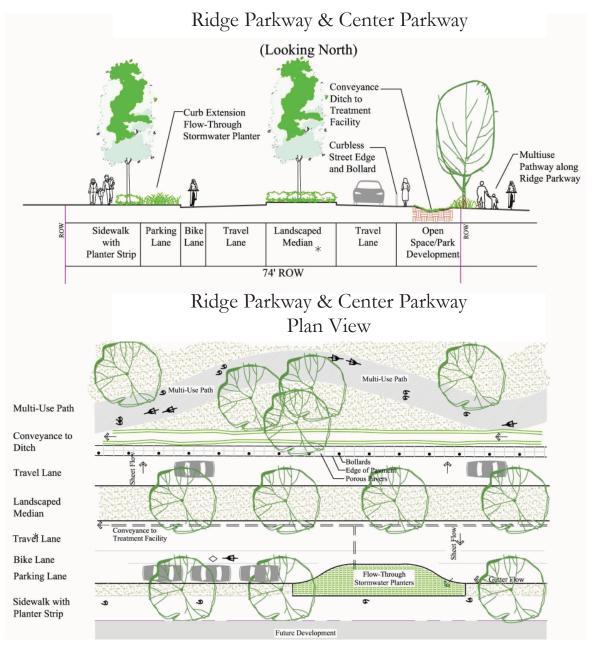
Ridge Parkway and Central Parkway Green Streets
